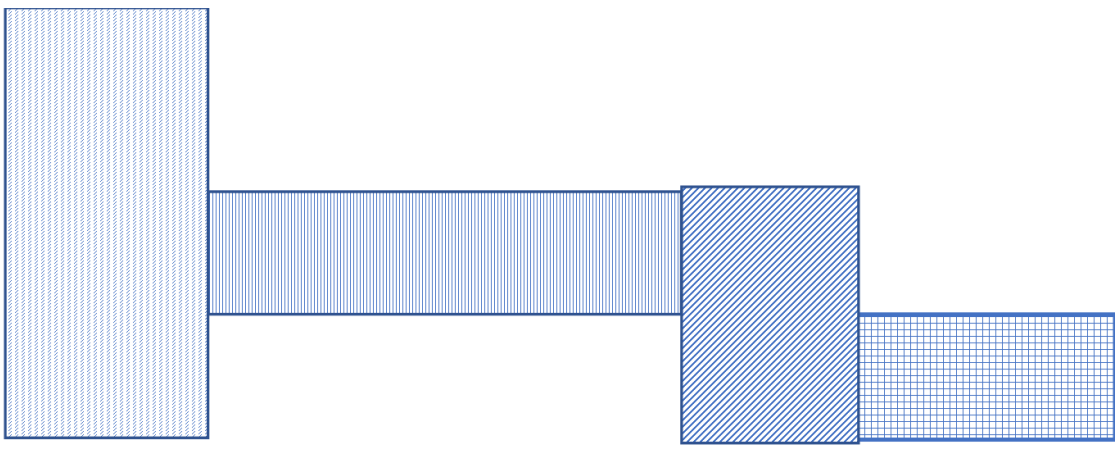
Image. Decking Sectioning for Deck Dimensioning
